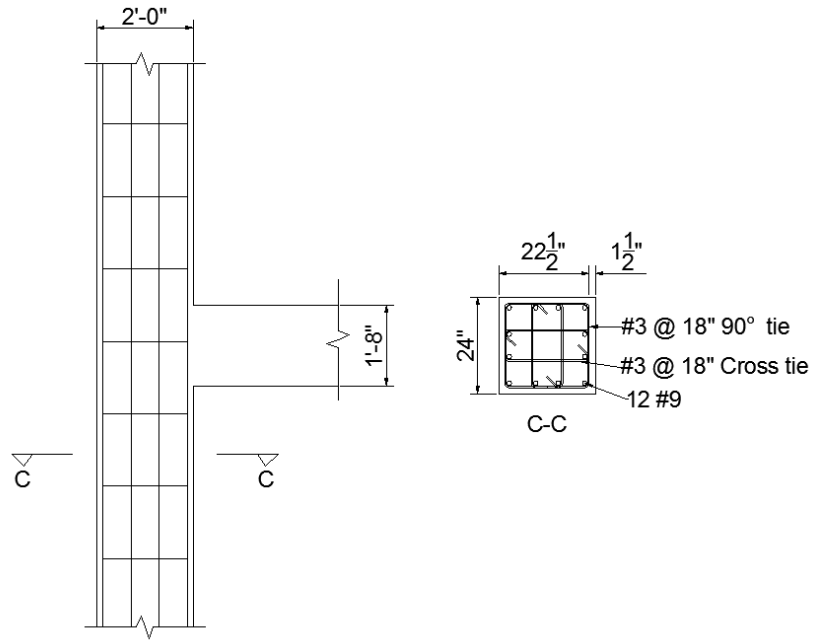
Reinforcement details for corner column of exterior frame 1 on the first floor
